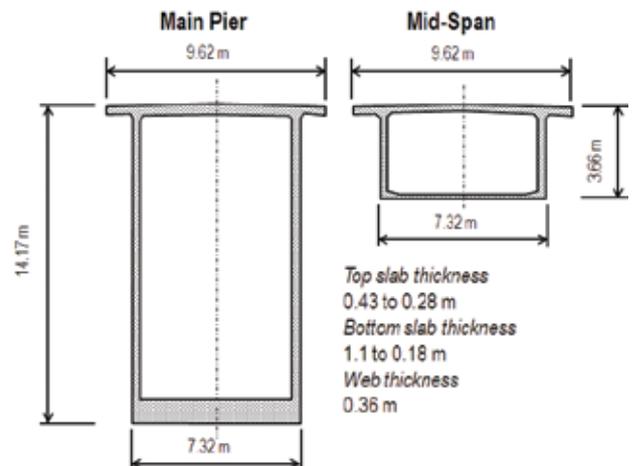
Main span cross sections (1 m = 3.28 ft)
